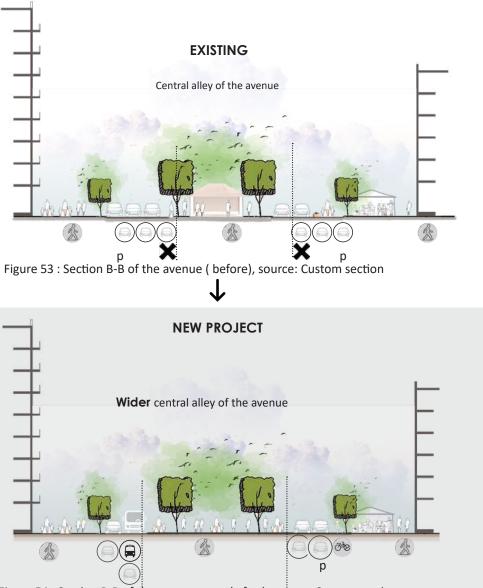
Section B-B of the new avenue (after), source: Custom section
